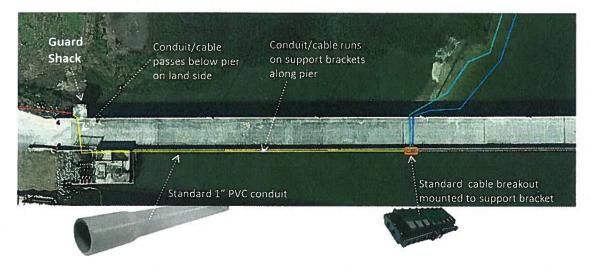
Conduit/cable installation detail from guard shack to cable breakout.
